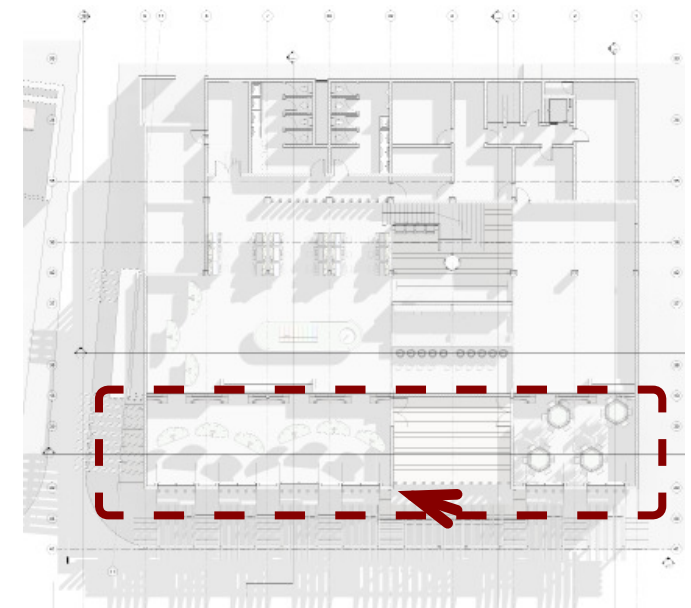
First floor street interaction Screening elements exist on horizontal and vertical planes.
